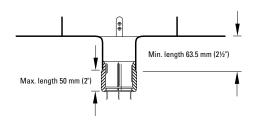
The minimum length of the metal retrofit drain stem with a U-Flow Seal Assembly.
